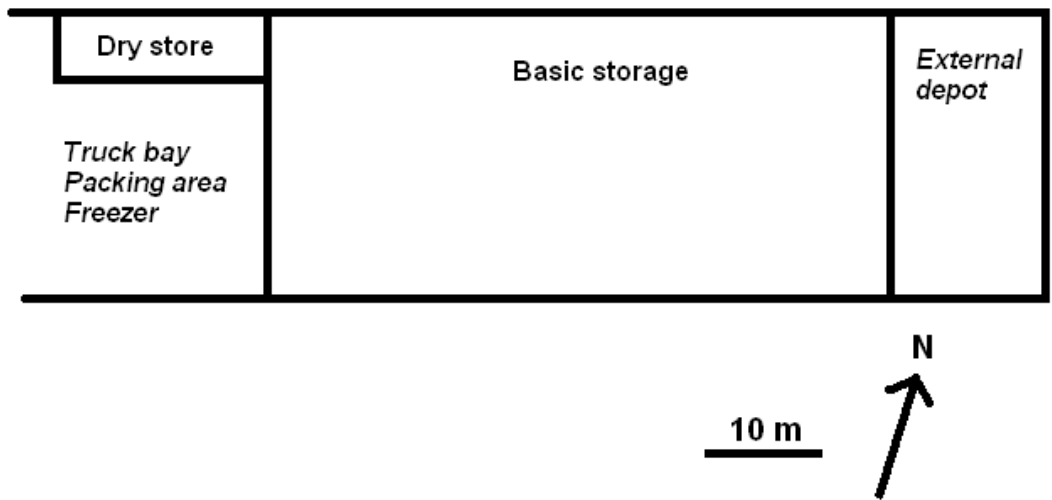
Floor plan (approximately to scale) of the storage areas. The dry storage area is located on the second floor.
